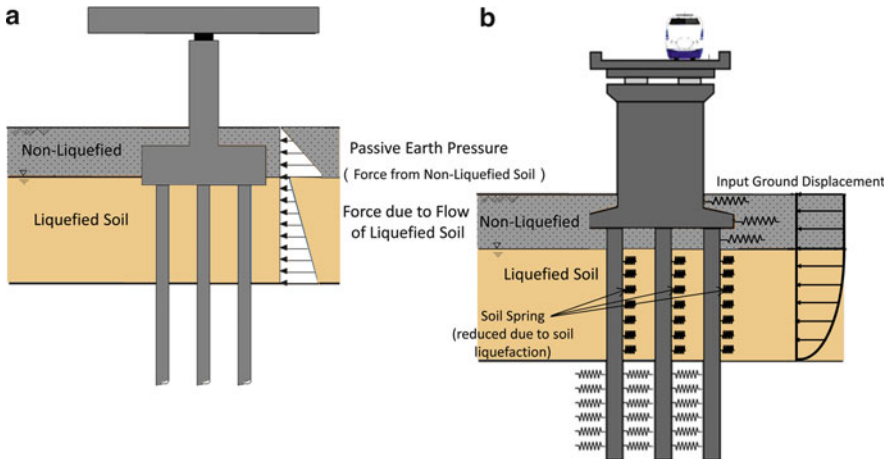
Earthquake resistant design of pile foundation against liquefaction-induced ground displacements. (a) Highway bridges [4]. (b) Railway bridges [30]
